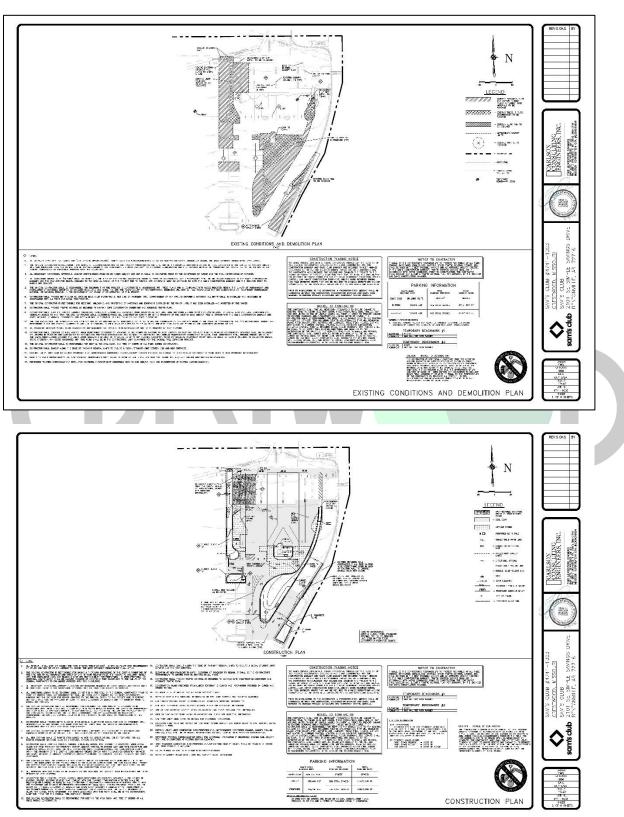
EXHIBIT B: DEMOLITION PLAN AND SITE PLAN
